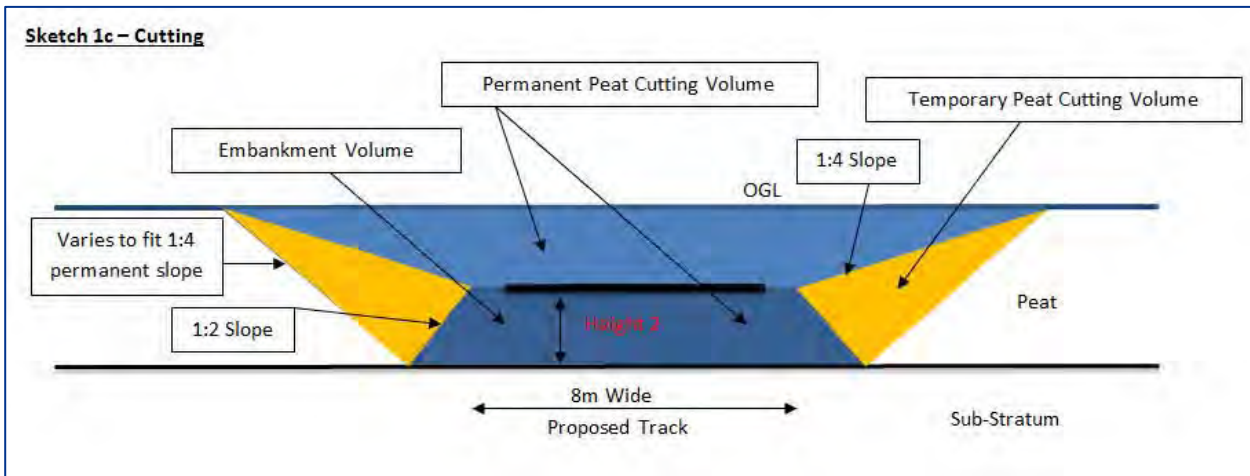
Diagrammatic Cross Section of the Proposed Kergord Access Track- Cutting with low rise Embankment
